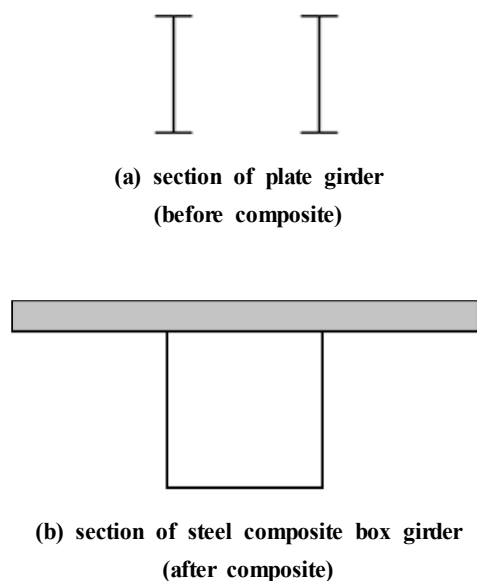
Sections of Plate Girder and Steel Composite Box Girder
